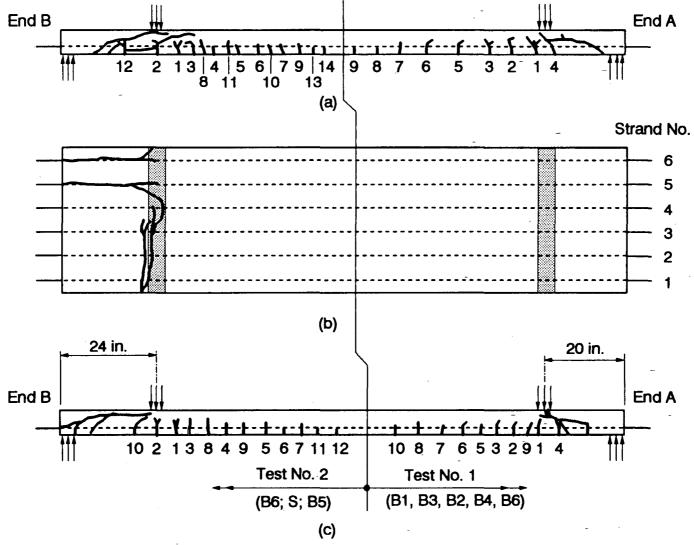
Crack patterns for D-type Specimen No. 14-6.0DC-1;
